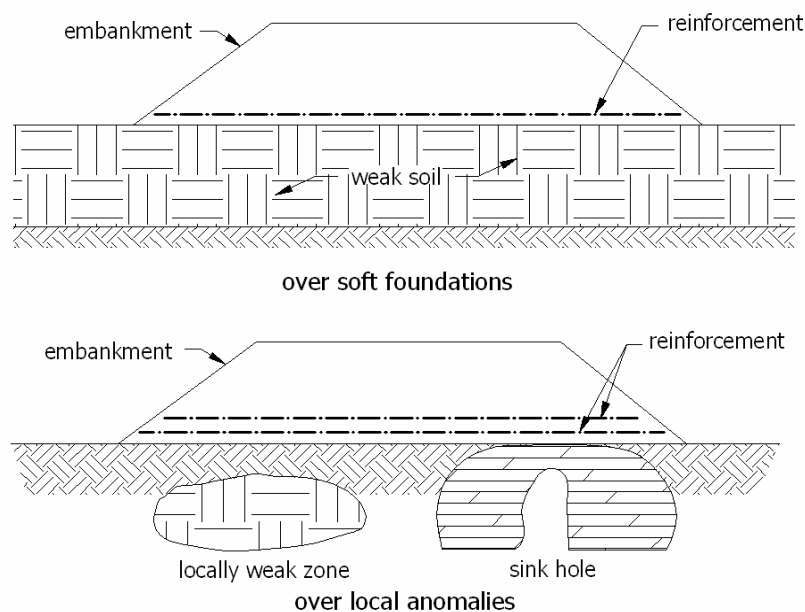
Reinforced embankment applications. Typical cases of using reinforcing geosynthetic below embankments on soft foundation soil
